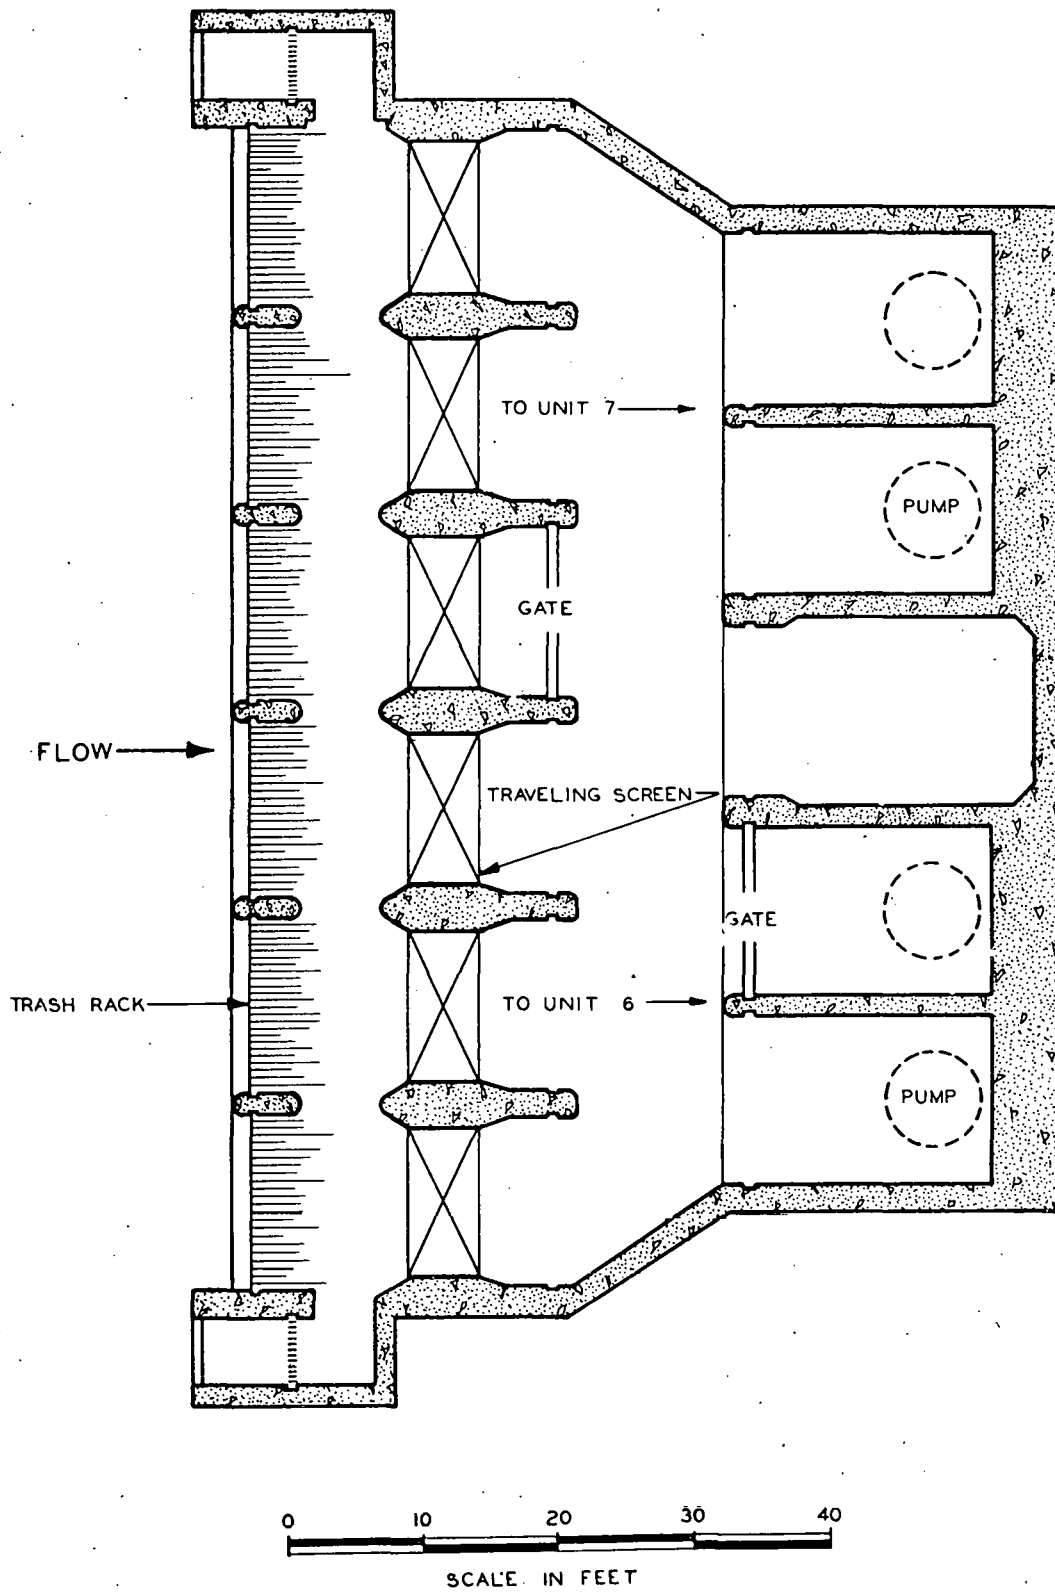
Plan at -14 Feet MSL of the Cooling-Water Intake Structure at Contra Costa Units 6 and 7.
